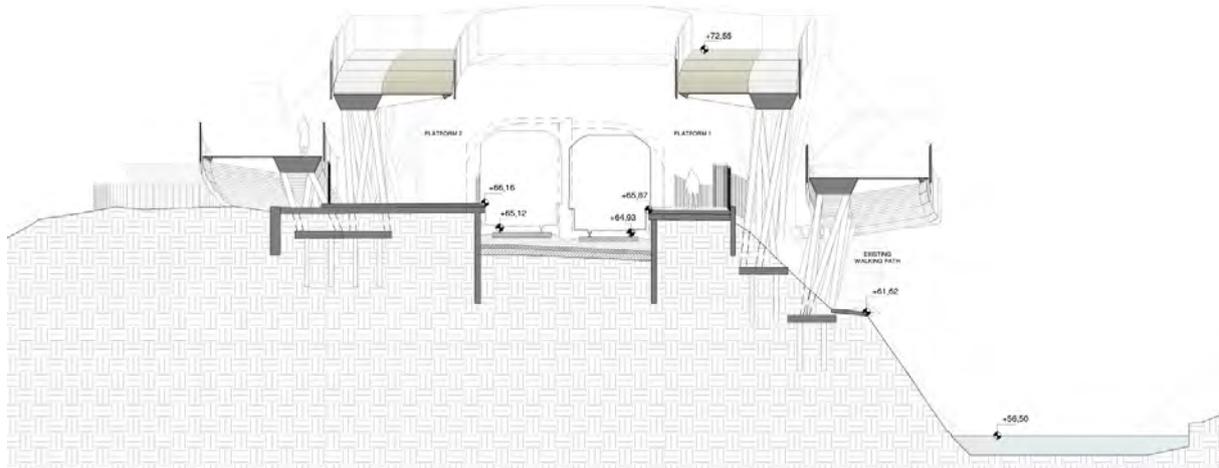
Section through Coolmine pedestrian bridge showing foundations
